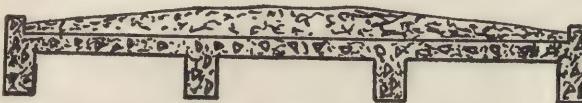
Cross-Section of a Concrete Girder Highway Bridge.
